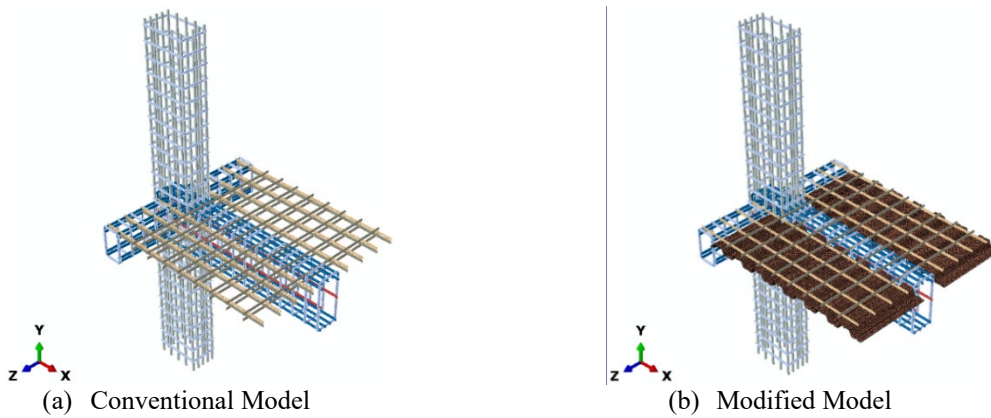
Finite Element Model of Reinforcement Layout in the RC Beam-Column Joint
